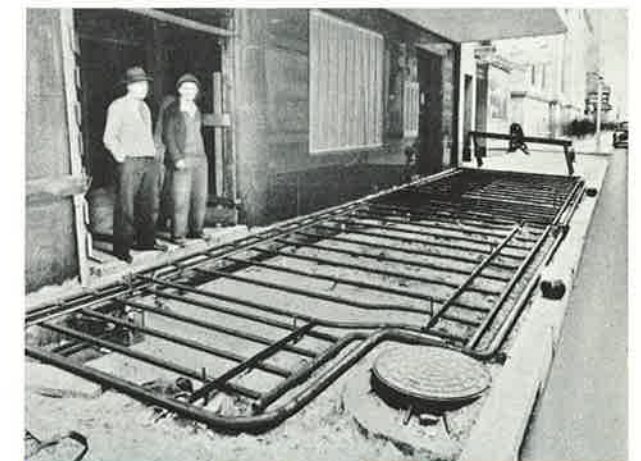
Construction photograph shows grid pattern used in sidewalk installation at Peoples Savings Bank. The sidewalk extends along two sides of the building.
